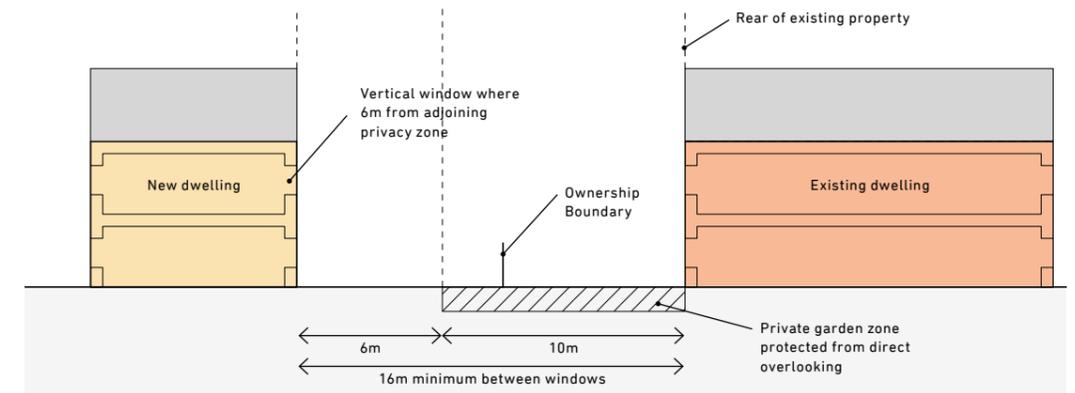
Where existing gardens are less than 10m deep, new conventional windows serving habitable rooms must still maintain a minimum 6m distance from the private garden zone
